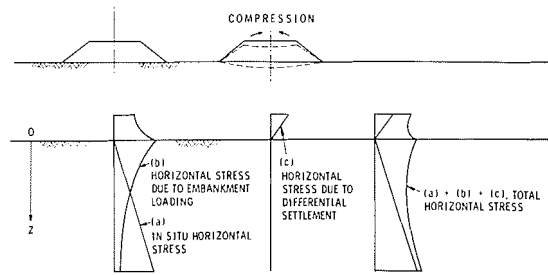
Generation of horizontal stresses under centerline of embankment on compressible clay.
